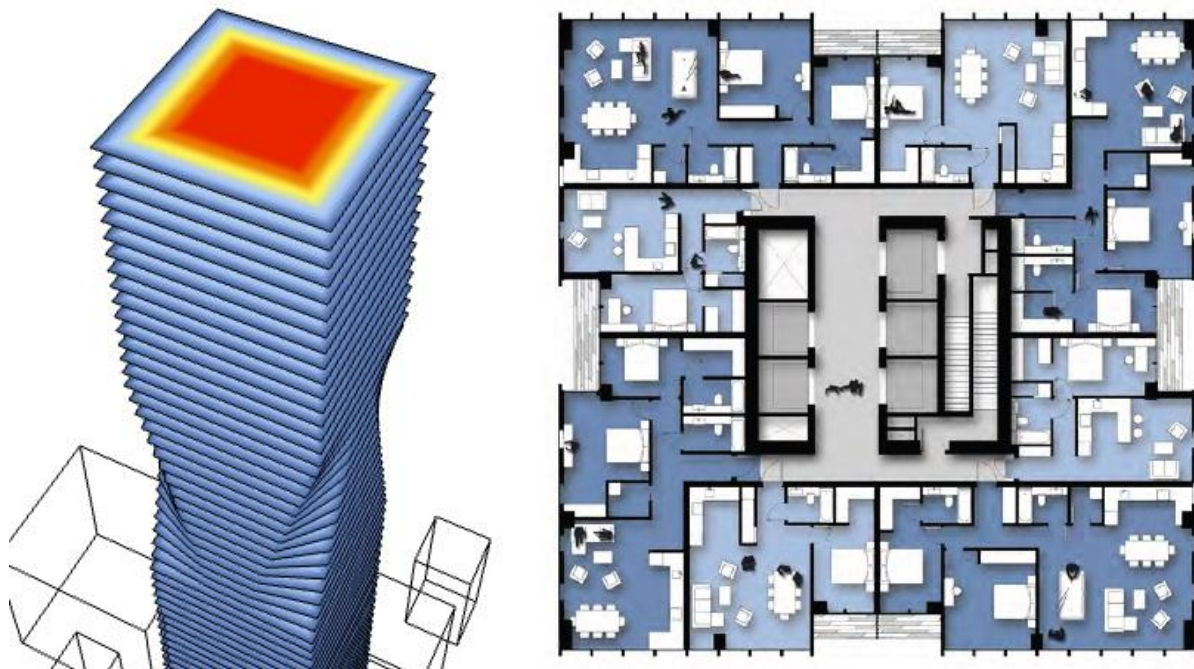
Left: Daylight analysis of the floor shape Right: Typical floor plans for medium sized apartments. Picture: Serneke
